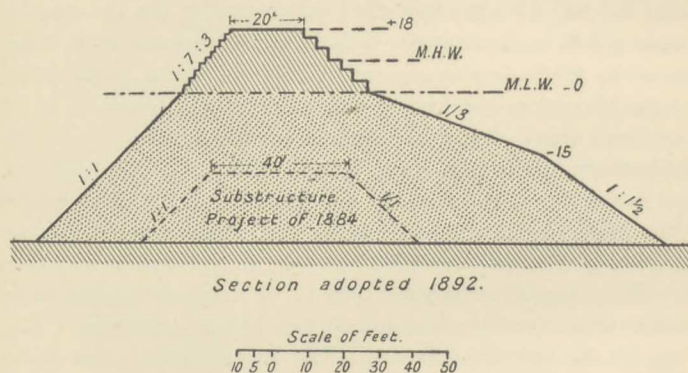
Section of Breakwater, Sandy Bay, U.S.A.
